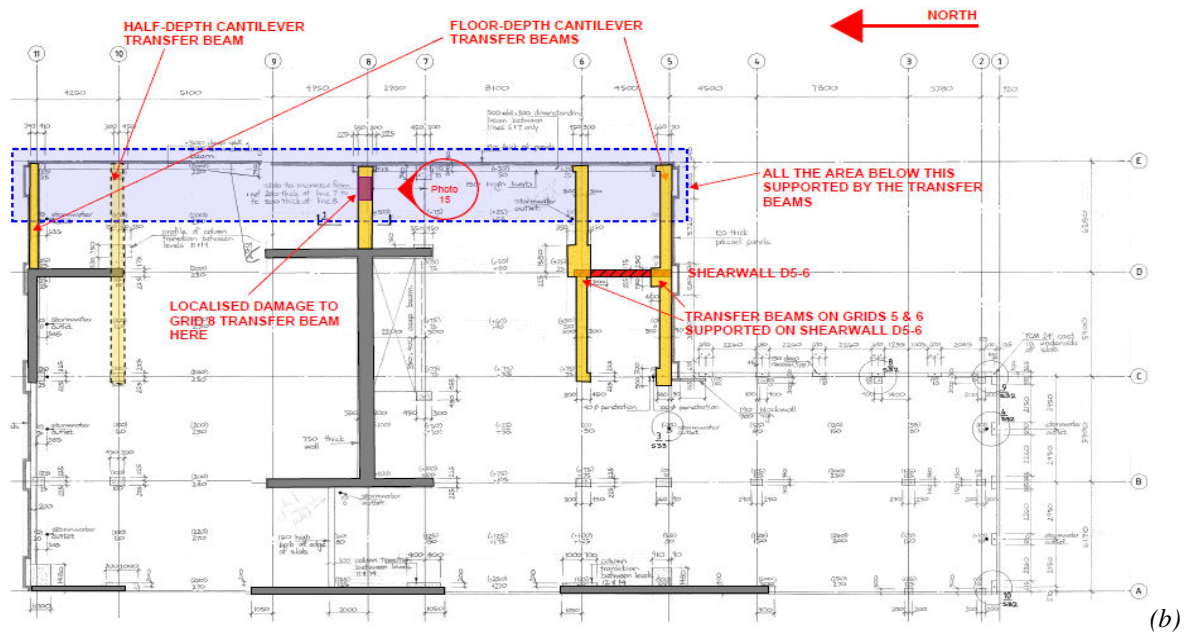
2: Study of a 1980s building showing deficiencies due to (a) irregularity in elevation; (b) irregularity in plan; (c) insufficient load path; (d) lack of reinforcing detailing of structural components (e.g. structural wall)
